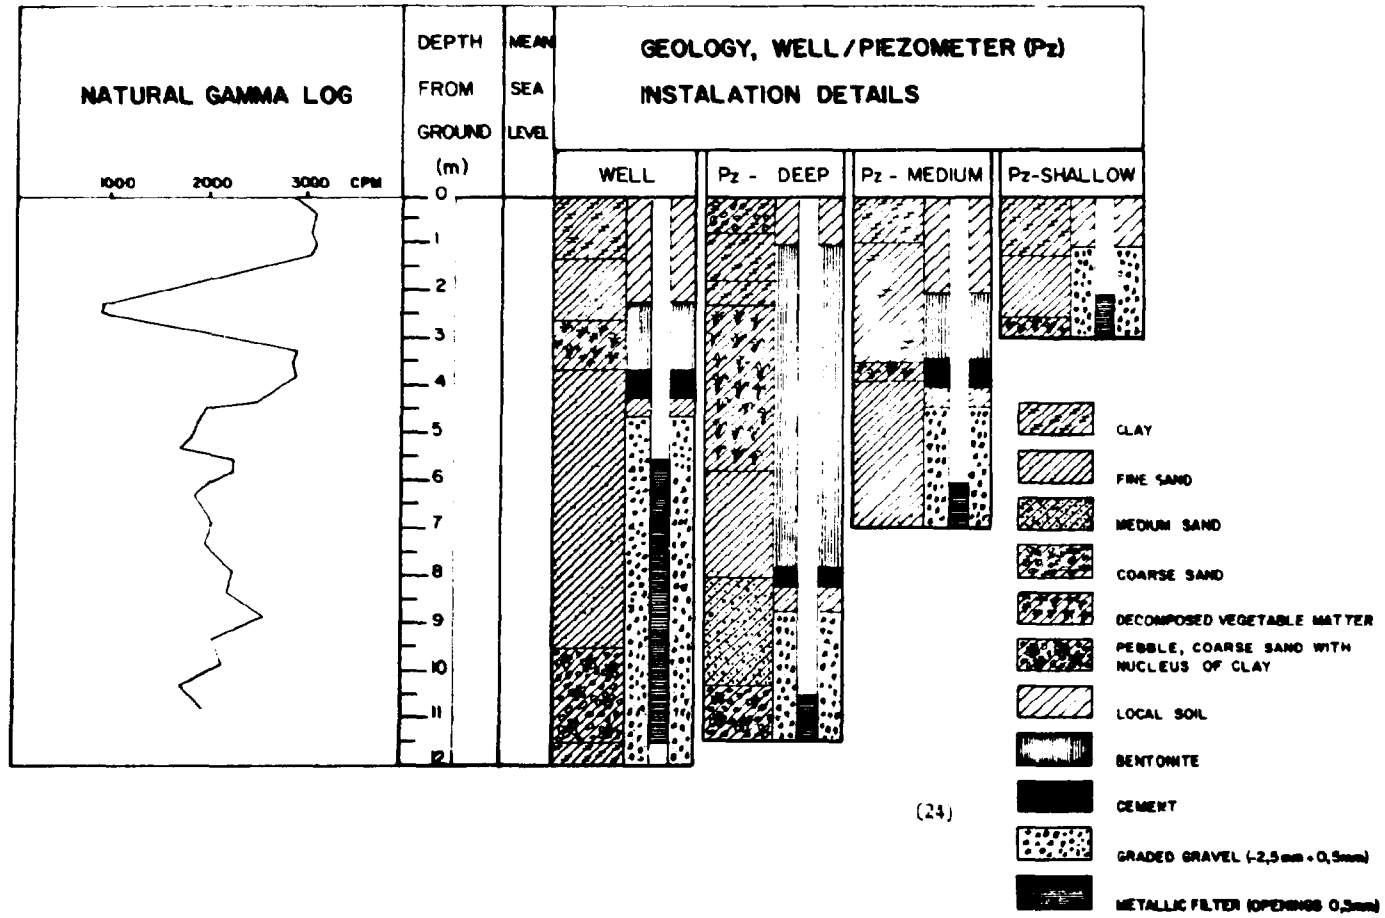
Detail of construction of the well, piezometers and local sub-surface geology⁽²⁴⁾.
